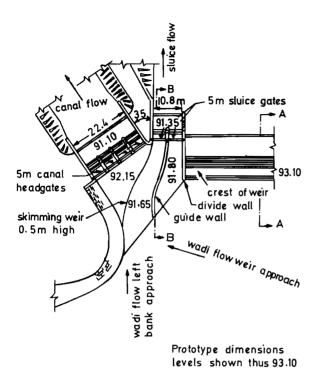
20 m³ s⁻¹ Headworks: Preliminary Layout
